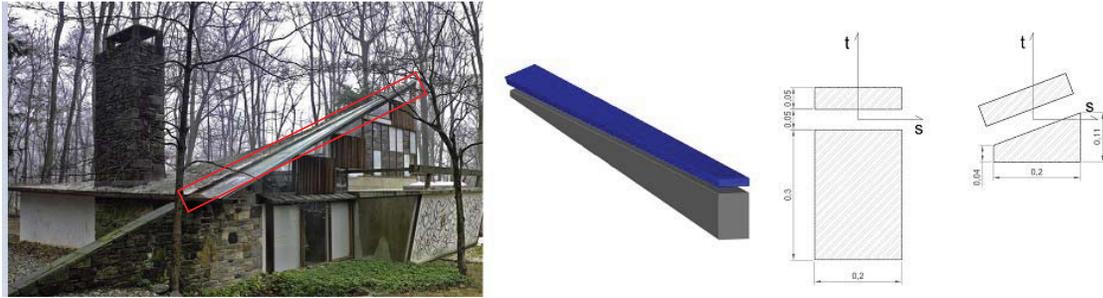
Localization of the tilted edge beams (left); scheme of tapered edge beam (center); top and bottom cross sections (right)
